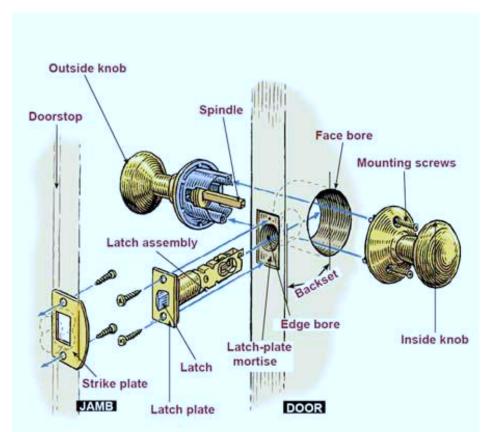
Area Latch Assembly - Mortise Lock
